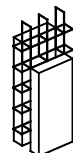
Detail of the foundation plan with Armopanel™ footing
